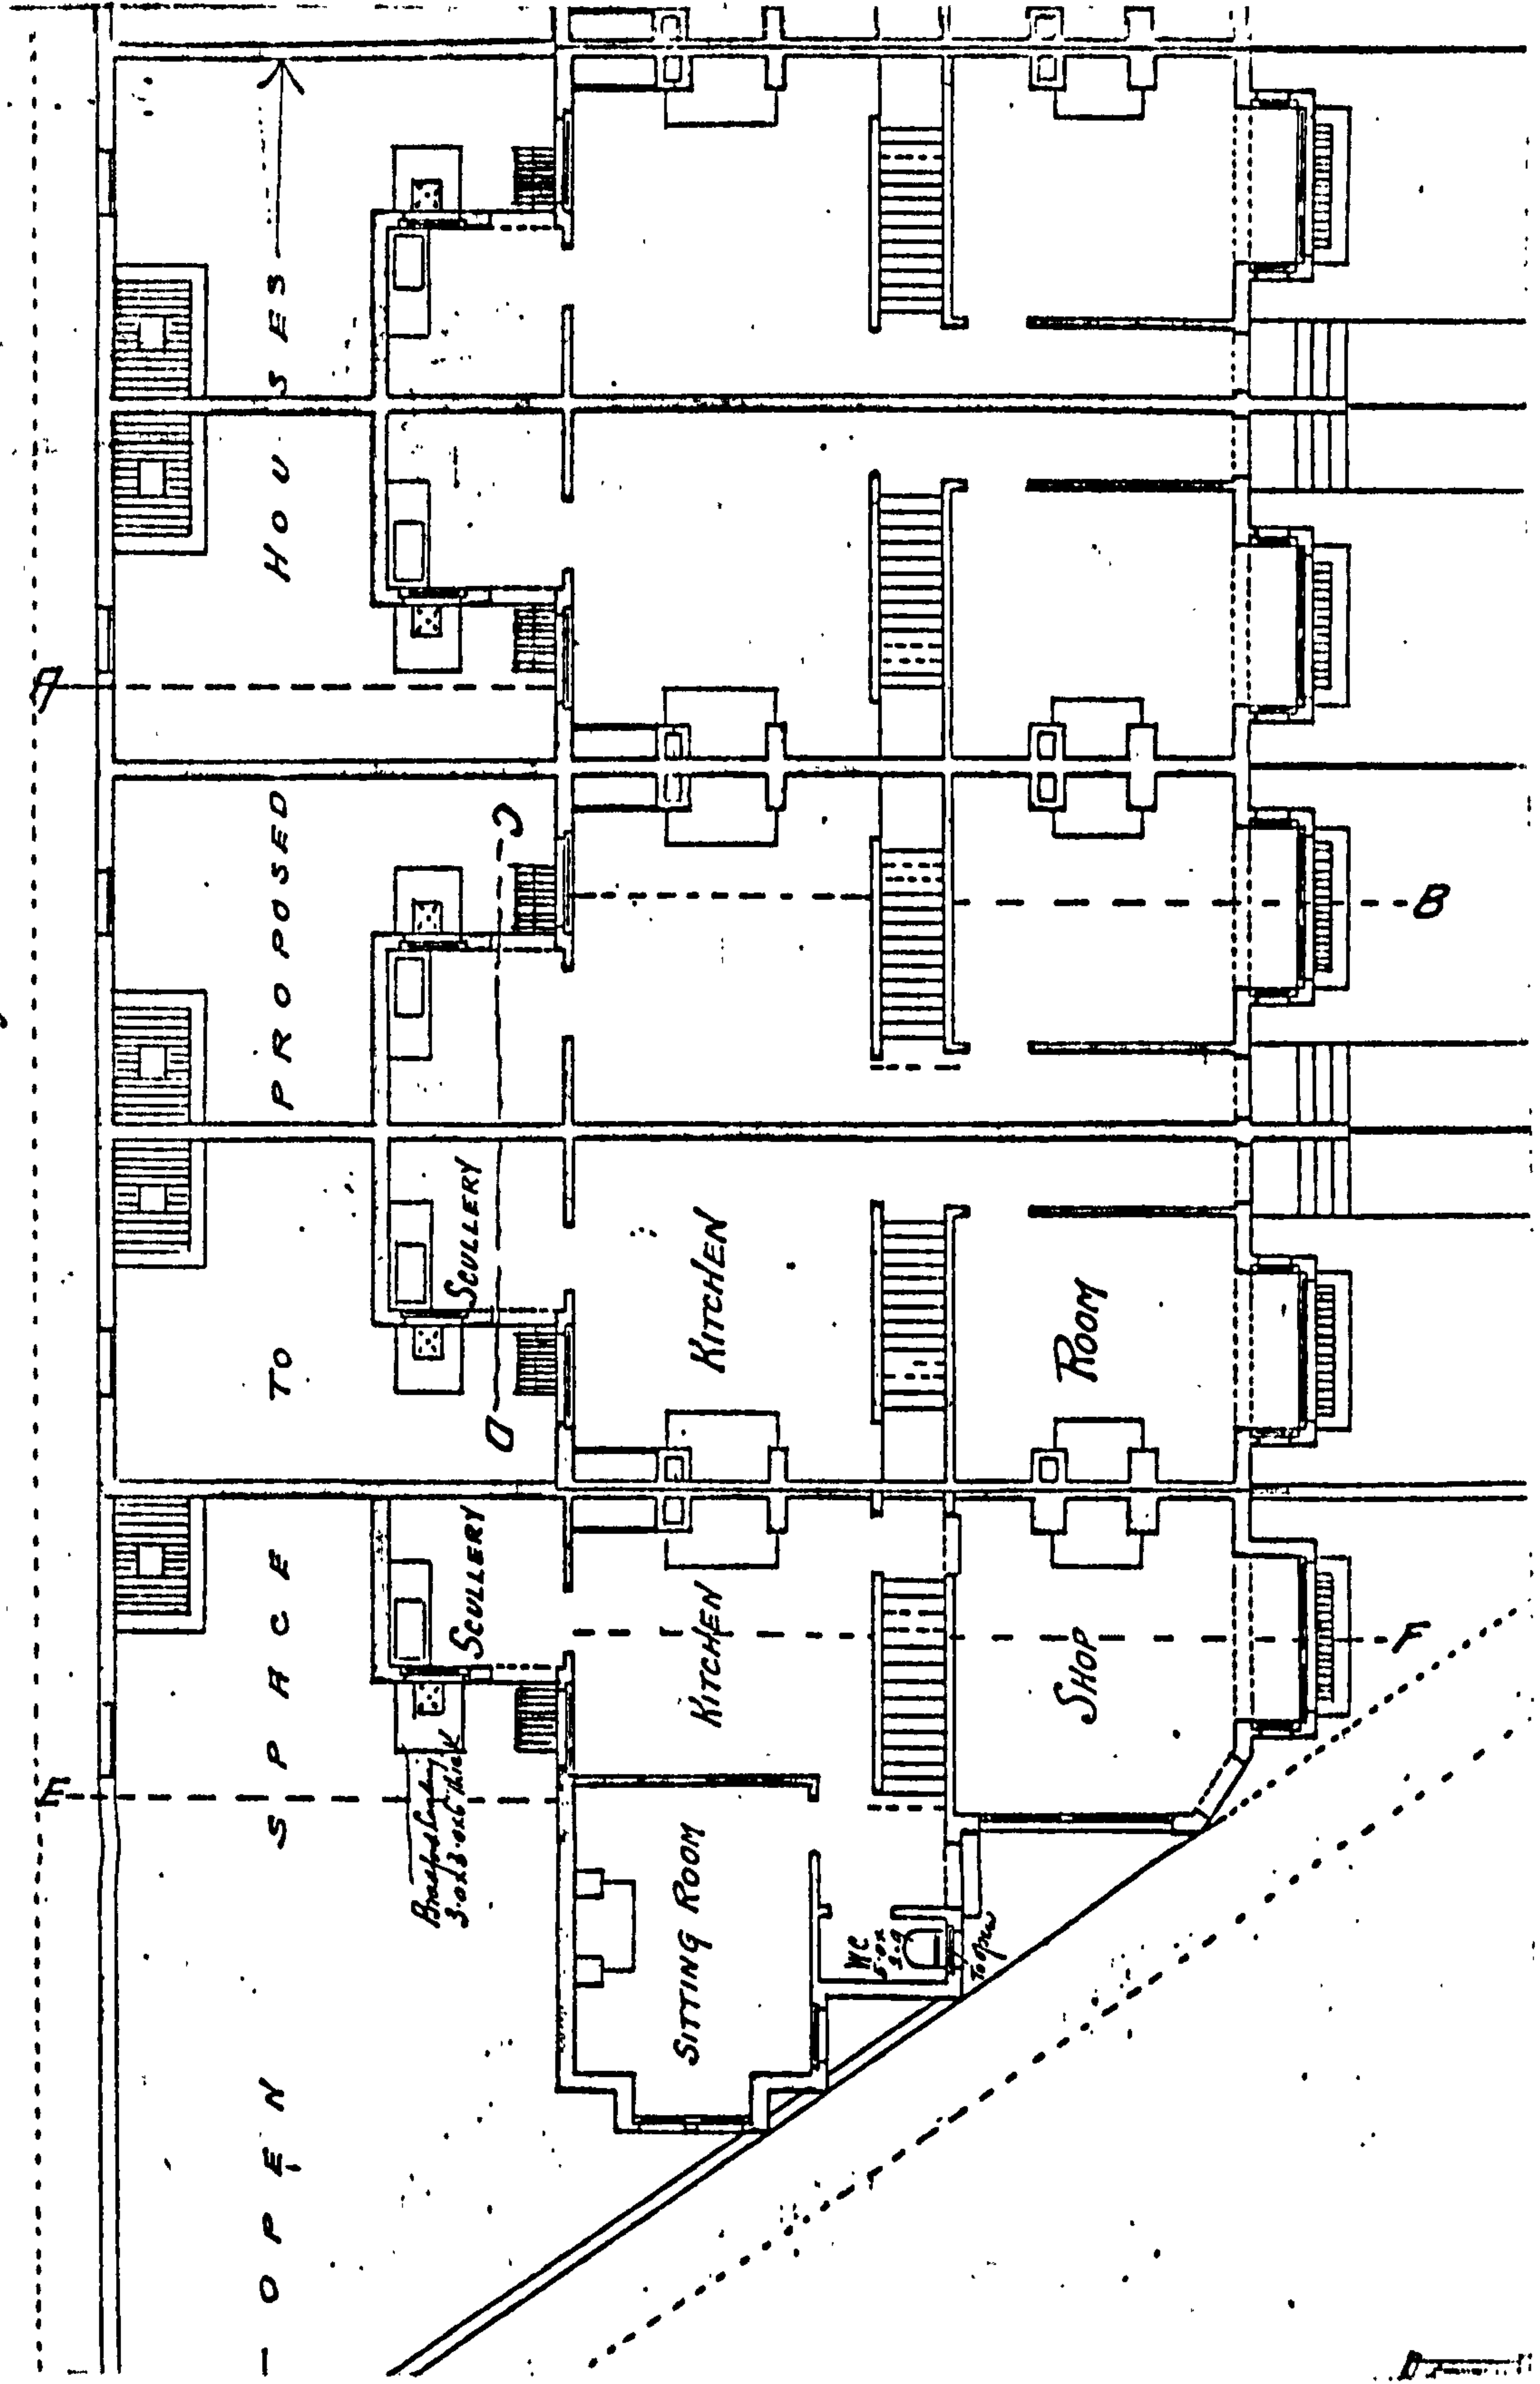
Deposited ground floor plan of five through houses and shop, Queens Road (A.E. Braithwaite 1897).
